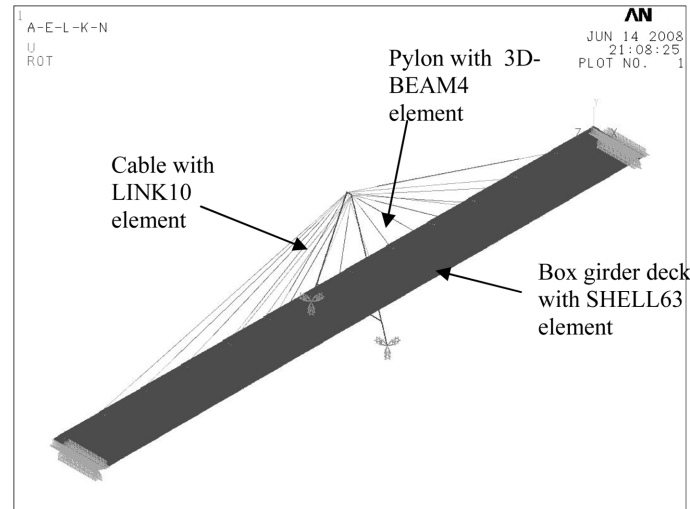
Finite element model of a cable-stayed bridge with Fan shaped cable and A- shaped pylon
